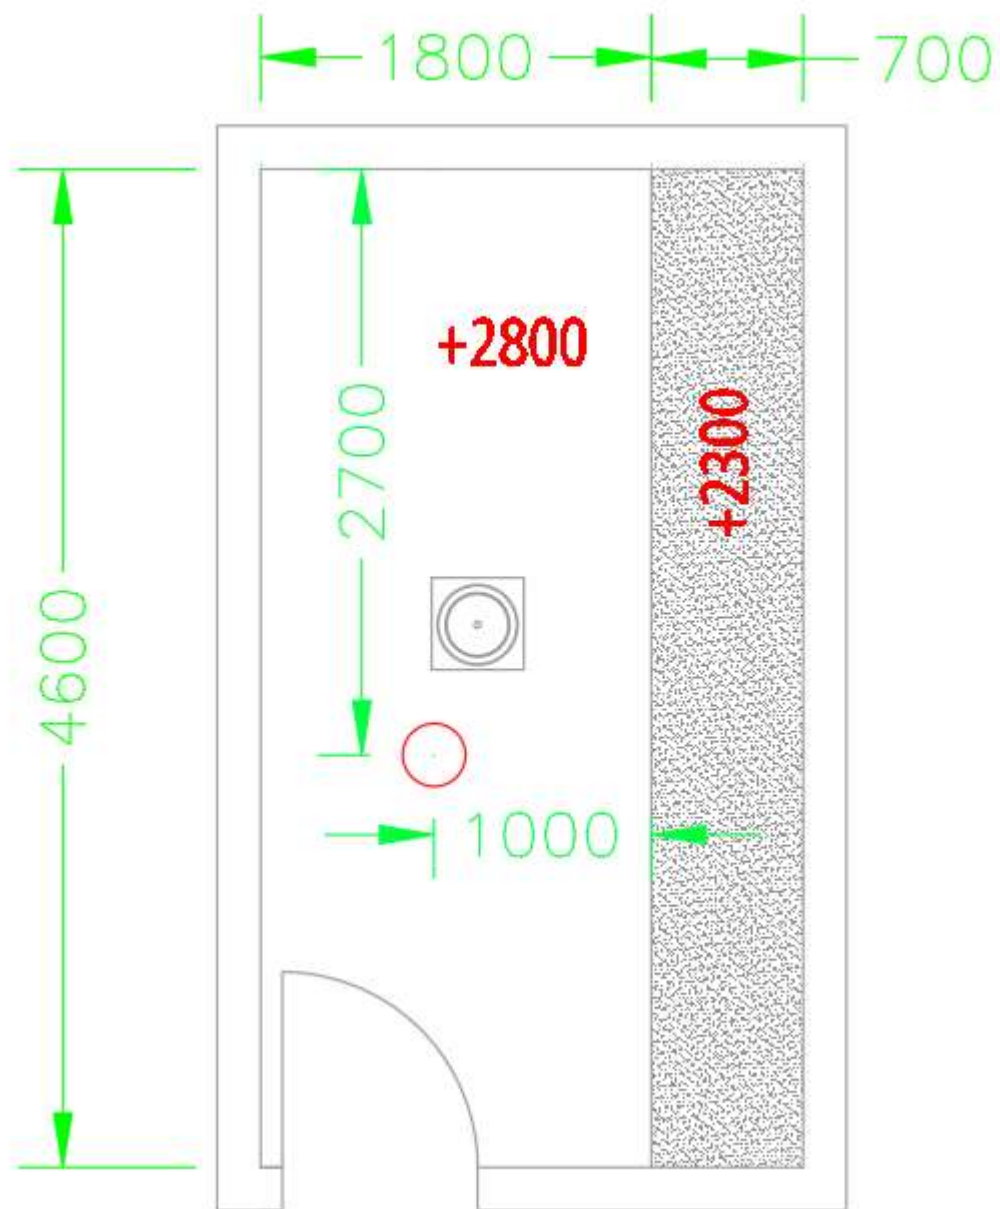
(b) Obstruction Against Wall (SSU/SSP).
